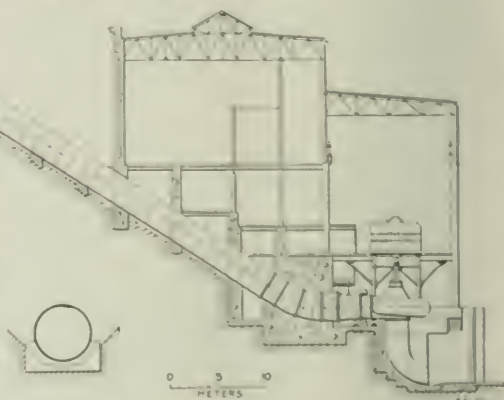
SECTIONS THROUGH POWER HOUSE, PENSTOCKS AND FOREBAY
